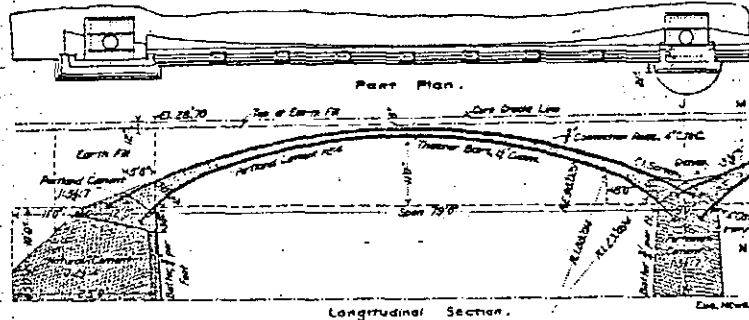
PART LONGITUDINAL SECTION OF REINFORCED CONCRETE ARCH BRIDGE AT GRAND RAPIDS, MICH.
